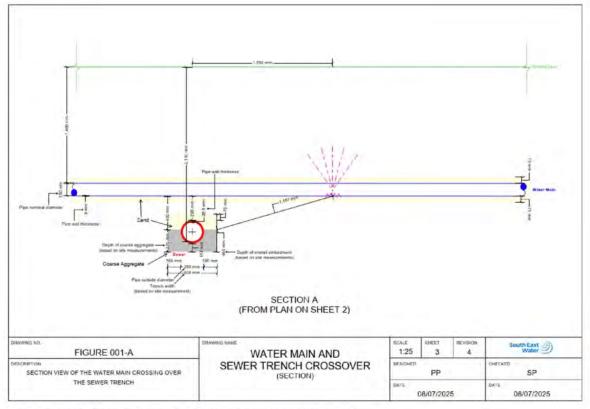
Section view of the Bayview Road water main crossing over sewer trench
